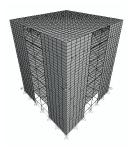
Building with soft storey with L- shape shear walls - Model 3
